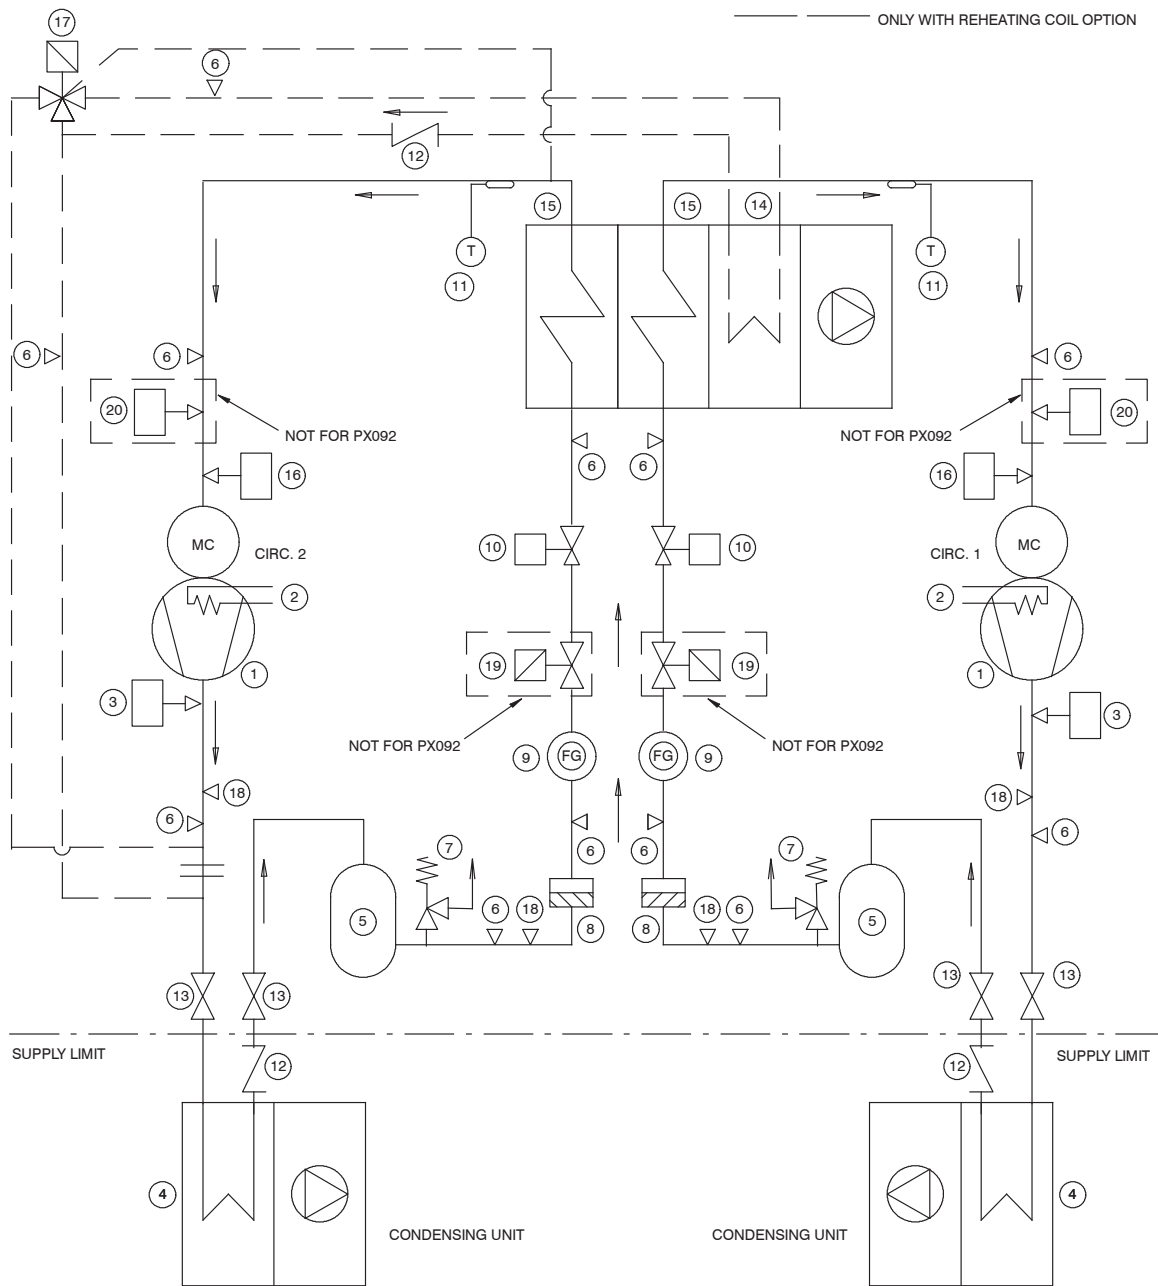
Refrigerant circuit A version - Dual circuits - Single SCROLL compressor - TXV
